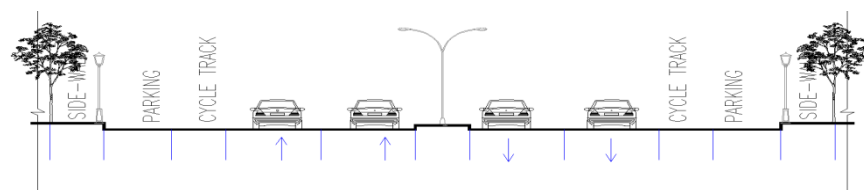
Proposed Minor Arterial Road Section (Source: Author)
